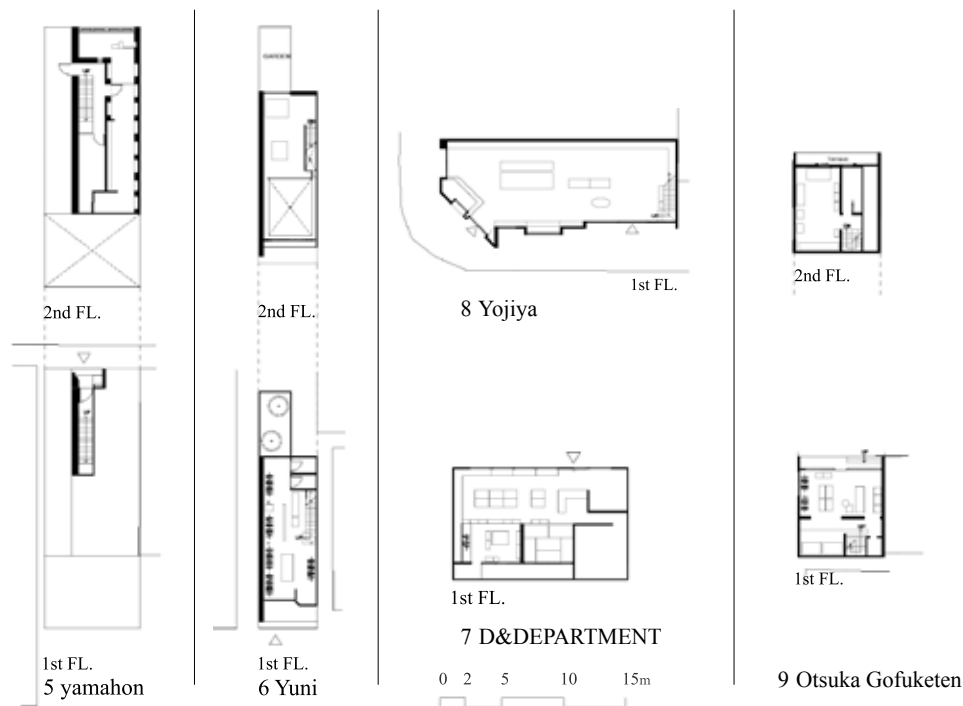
cont... Layout plans of the nine stores. Source: author's observations, 2020.
